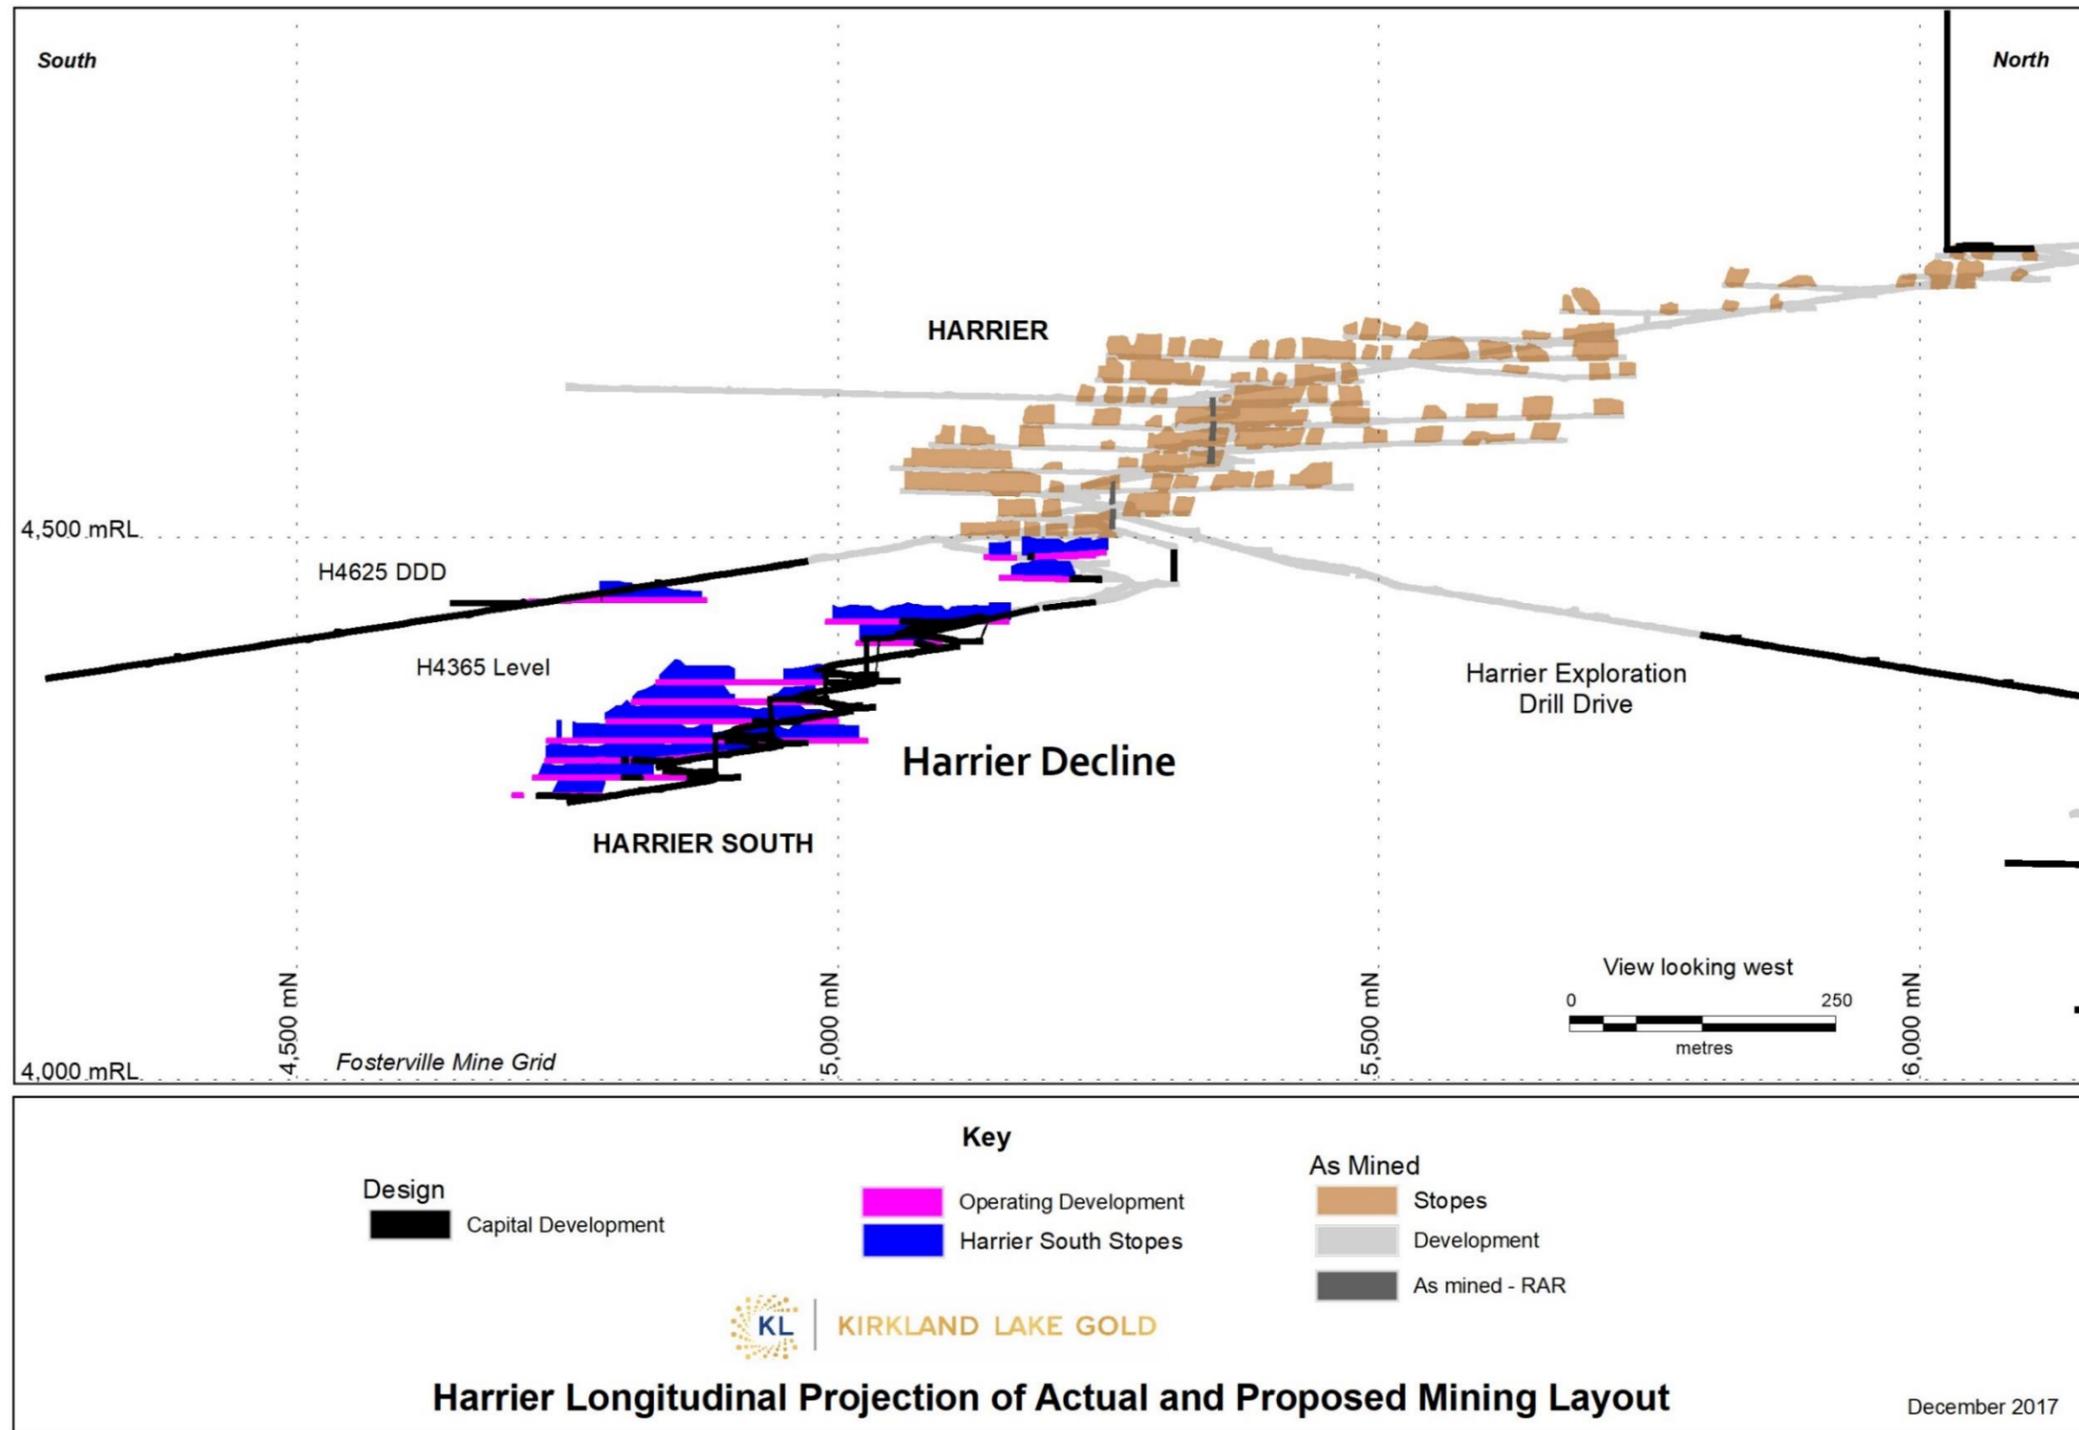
LONGITUDINAL PROJECTION OF HARRIER ACTUAL AND PROPOSED MINING LAYOUT AS AT DECEMBER 31, 2017
